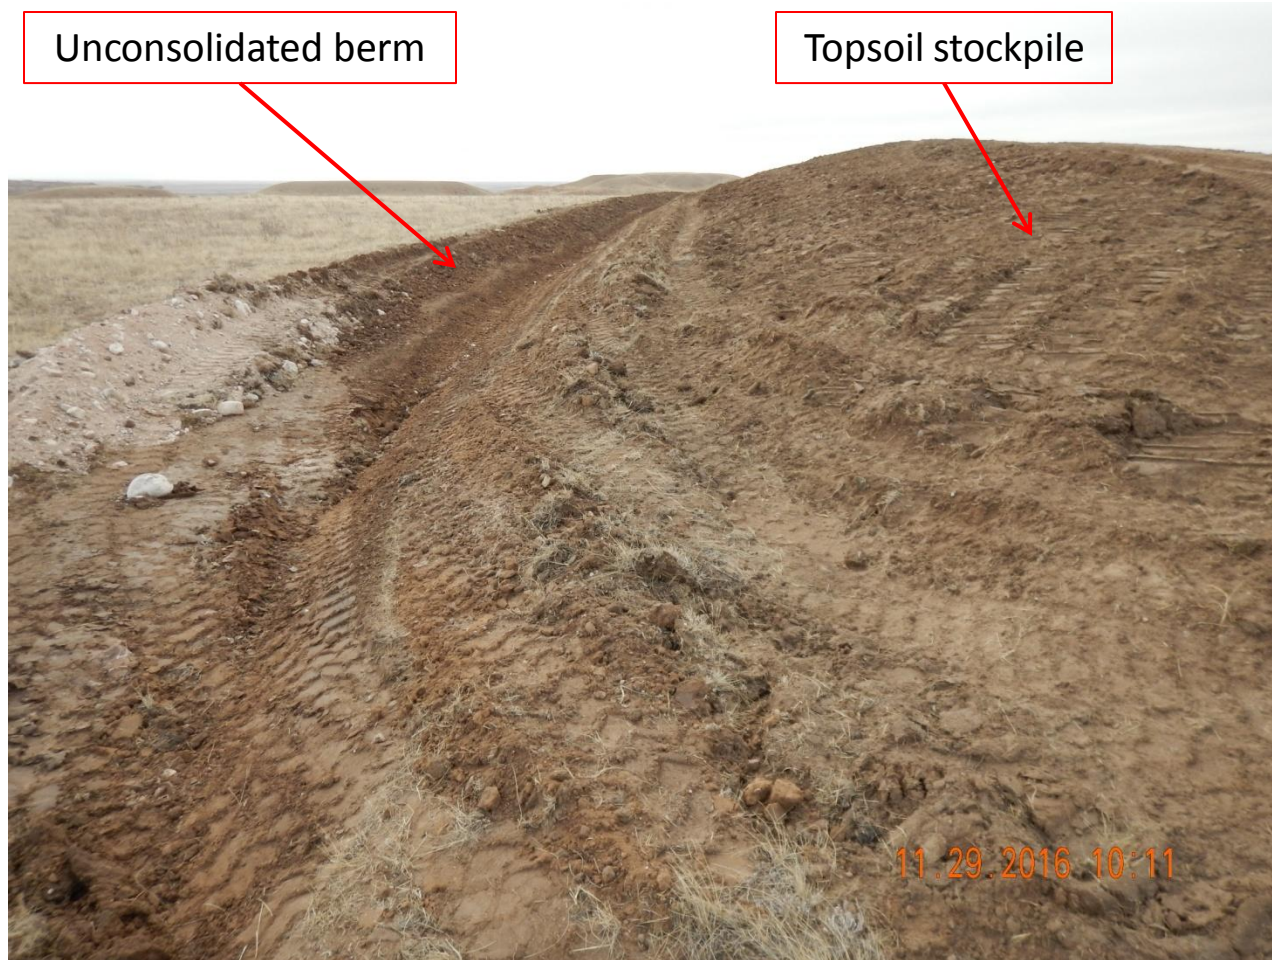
Photo taken from the northeast location , facing South. Ditch and berm BMP installed around the location perimeter. Berm shall be compacted to ensure containment of sediment laden storm runoff is directed to the sediment trap. Topsoil stockpile has been stored and separated along the eastern location. Need to stabilize topsoil stockpile from degradation due to wind and water erosion per Rule 1002.c.
